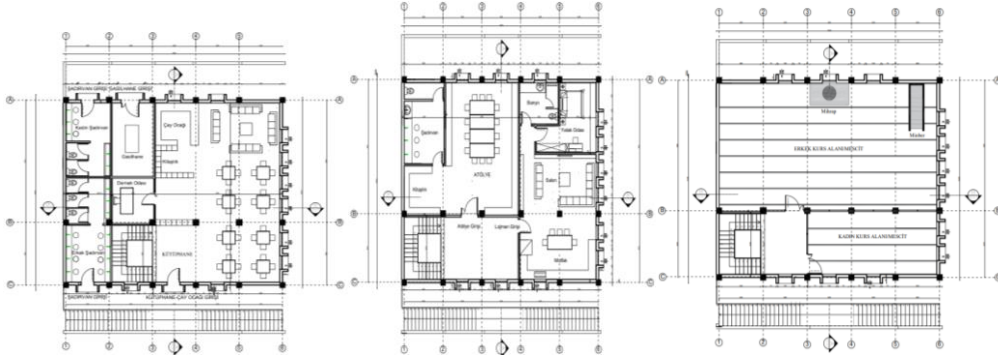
Hz. Ebubekir Mosque site plan (Drawn by the author).
